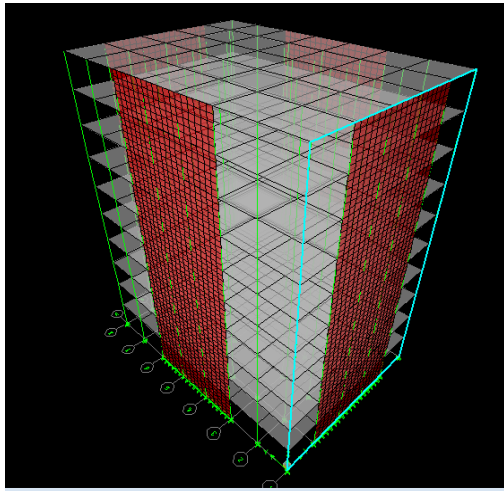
3-Dimensional View of 10 storied structure with Channel shear wall
